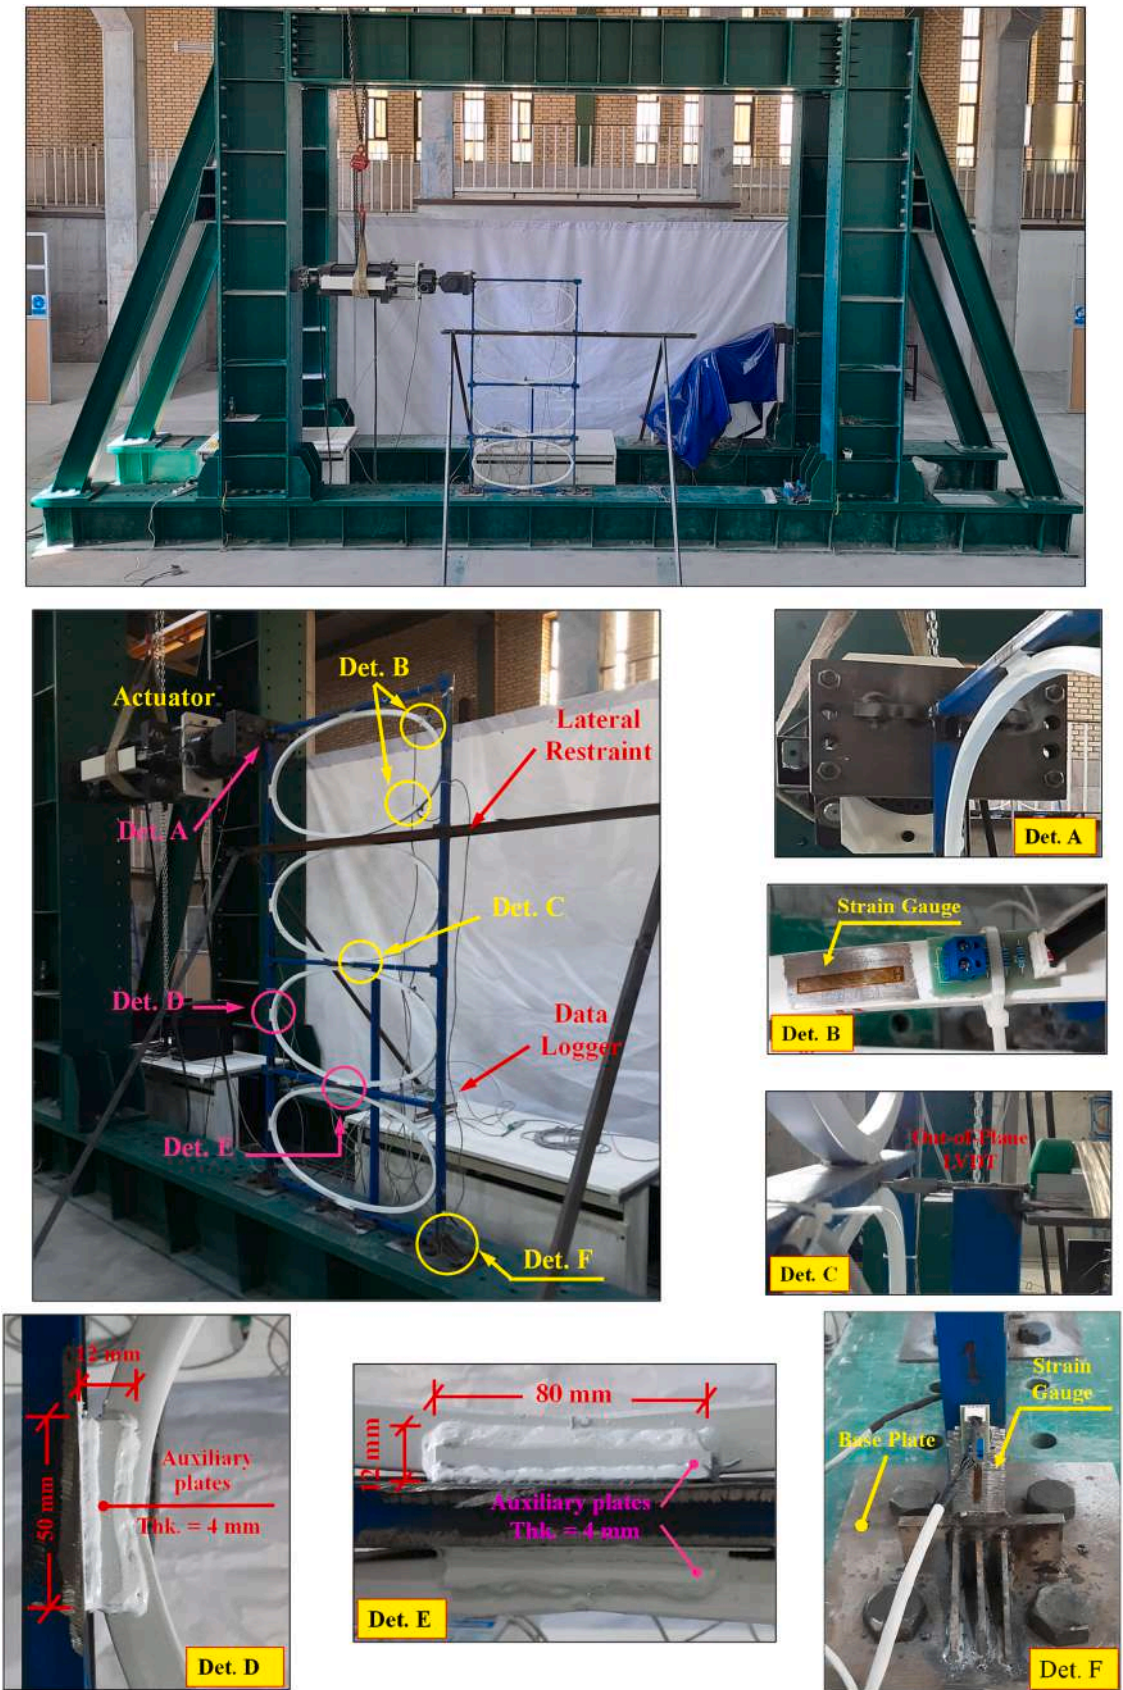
Test set-up configuration, Strain gauges, and out-of-plane LVDT in ELBRF specimen.
